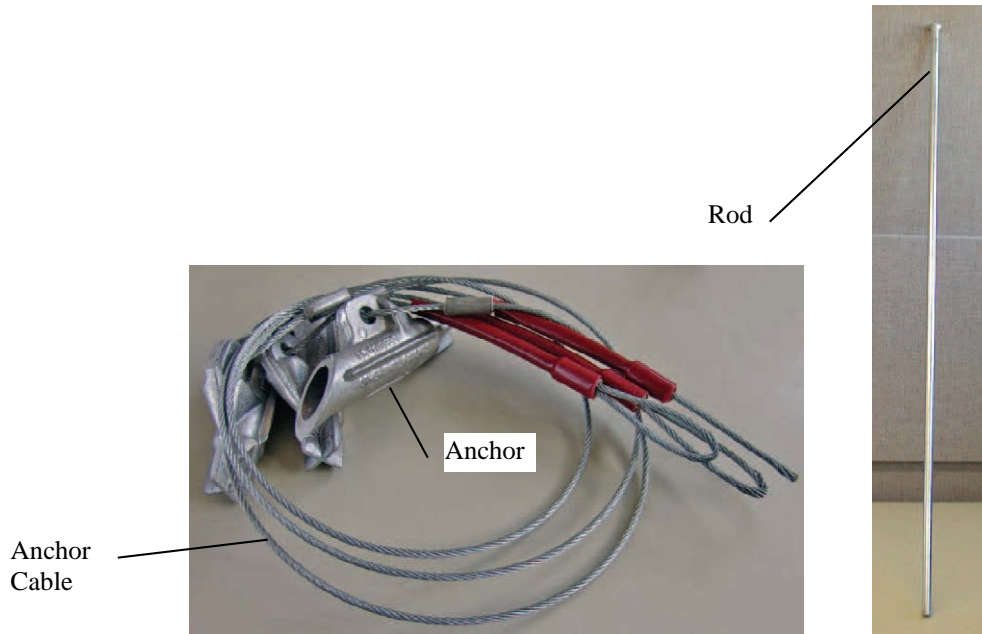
19282 duckbill anchor and cable assembly (left). The 25699 has a threaded rod instead of the cable. The drive rod (right) is used for both the 19282 and 25699.
